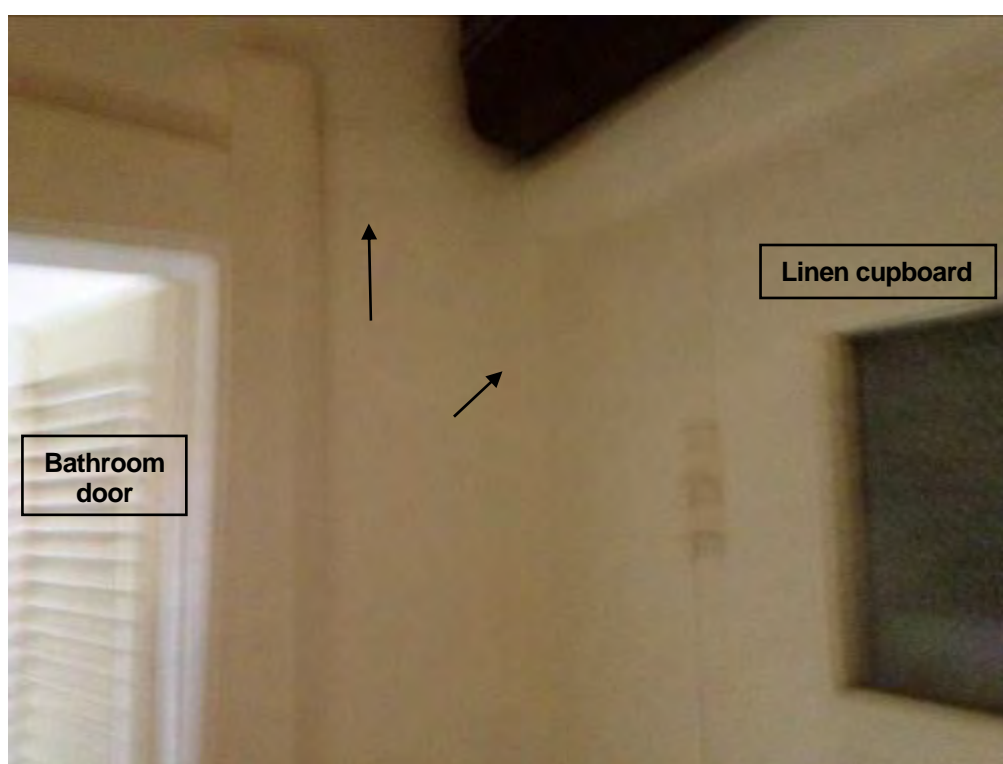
shows a radial hairline crack extending from the right hand side of the doorway head to Bedroom 2
